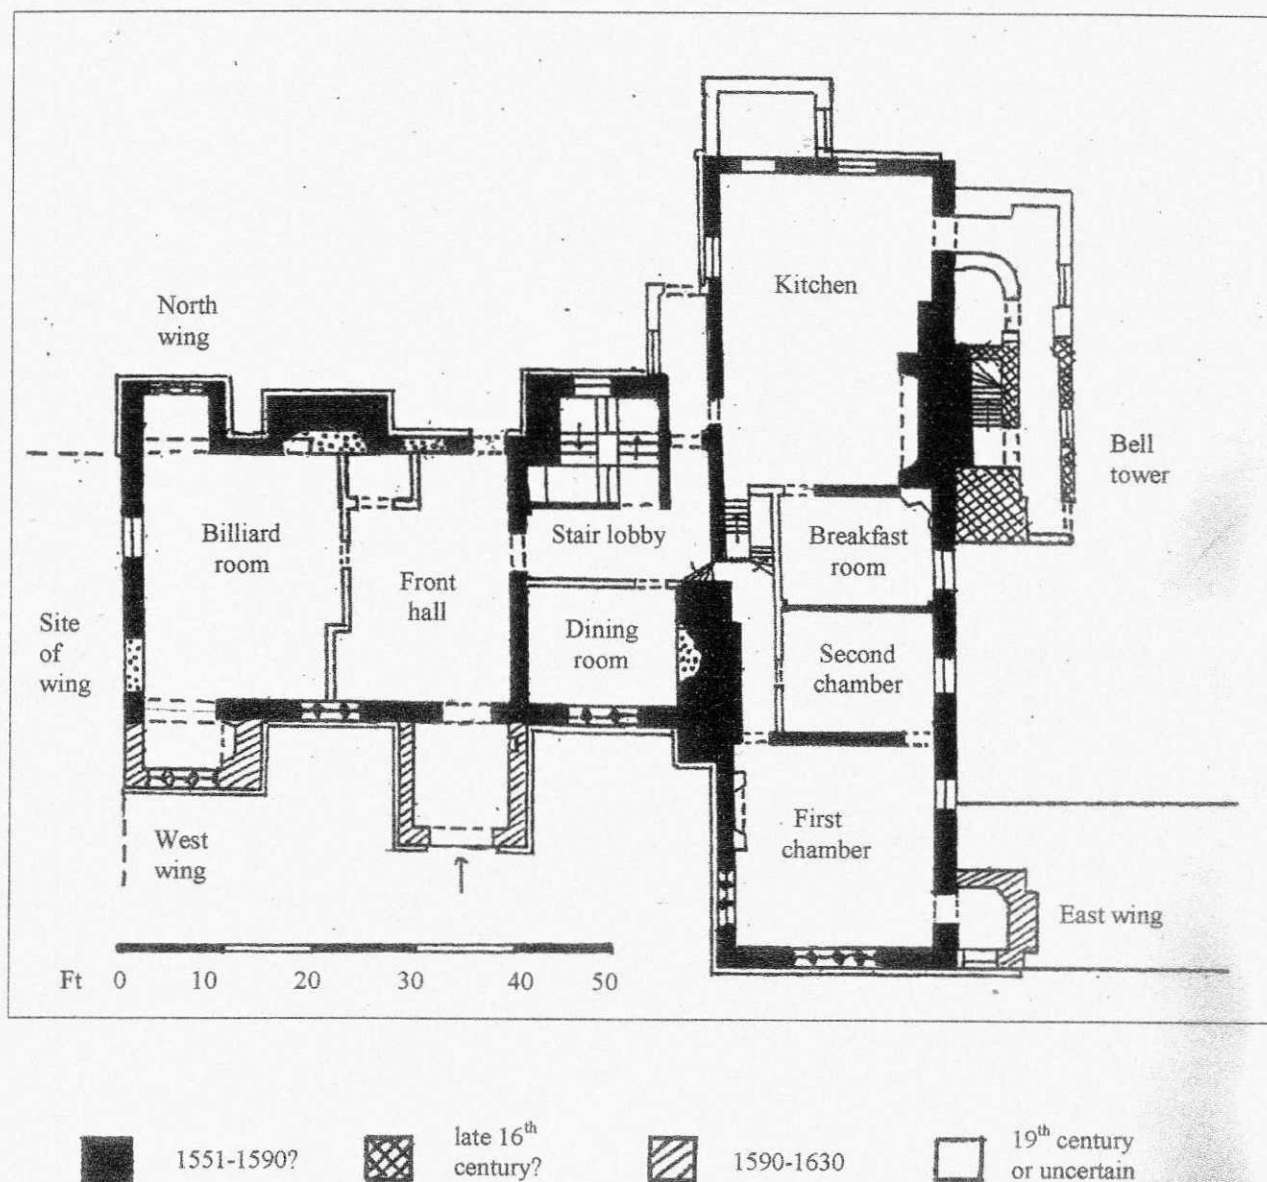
Ground floor plan, showing names of rooms and building sequence
